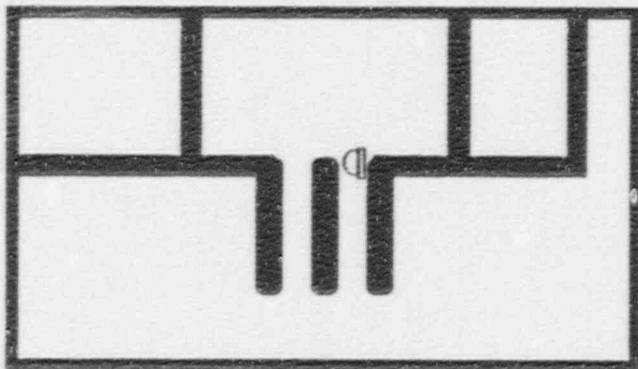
Perry 1 and 2 Emergency Service Water Pump House Section, Looking West
